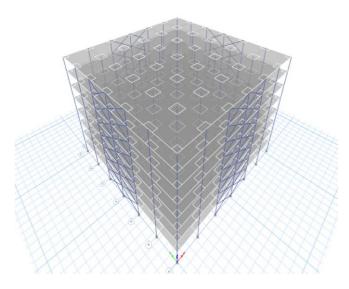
Flat slab with bracing having(G+8) story building (3D View)
